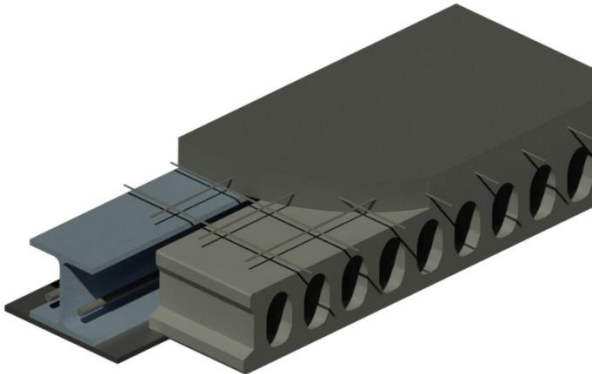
Slim-floor beam with hollow core slabs. 3D general view [73].
